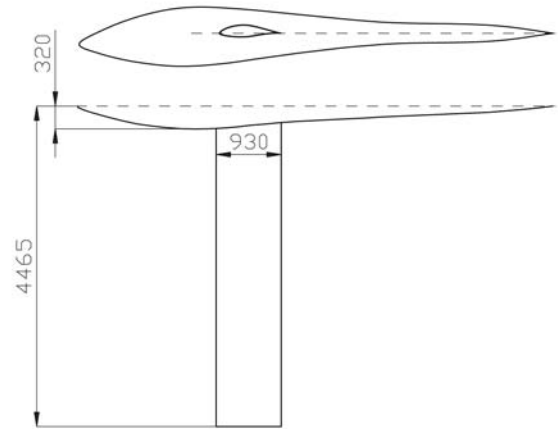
Sketch and dimensions of the geometrical model used for CFD calculations.
